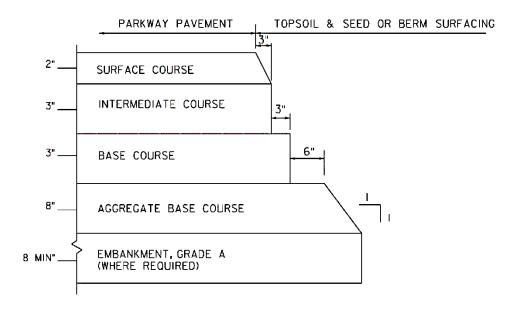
20: PARKWAY PAVEMENT SECTION (MAINLINE, RAMPS & SHOULDERS)
